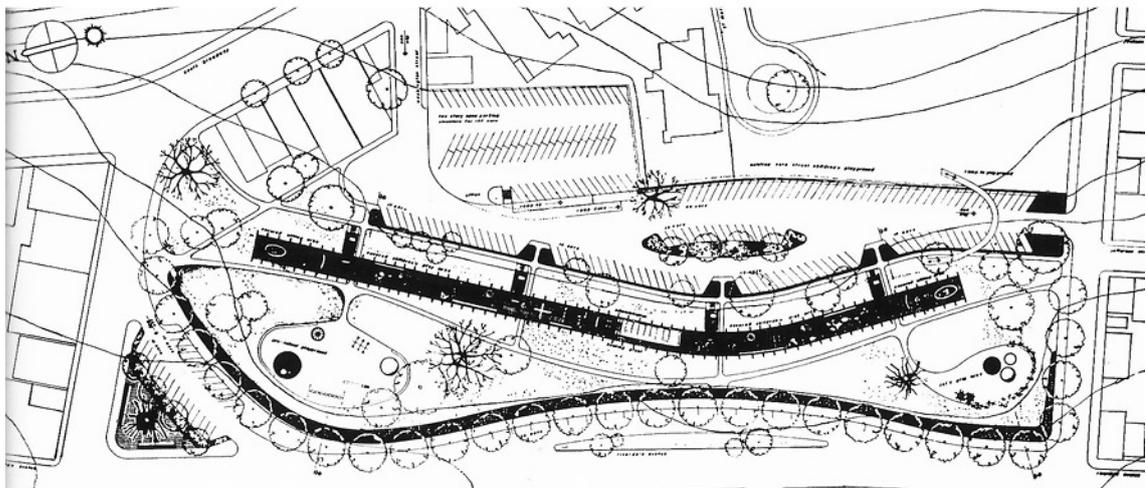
Eli Rabineau, Hudson Terrace Apartments (New York, 1953). Site plan.
